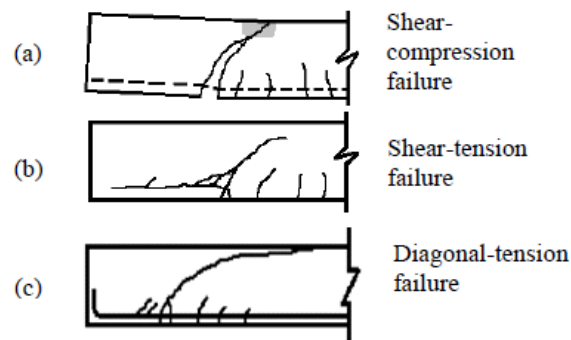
Shear failure modes for reinforced concrete beams (Abdul Samad et al., 2016)
